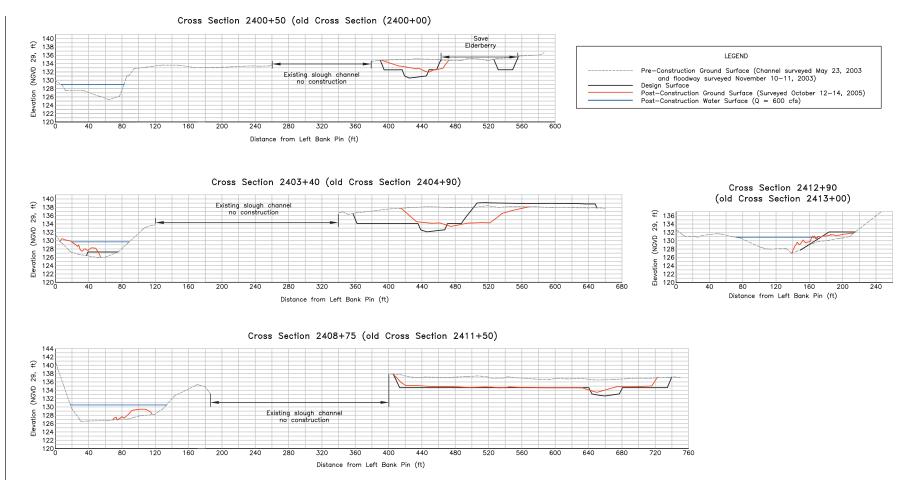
Bobcat Flat existing, design, and as-built cross sections. Cross section locations are shown on Figure 15.
